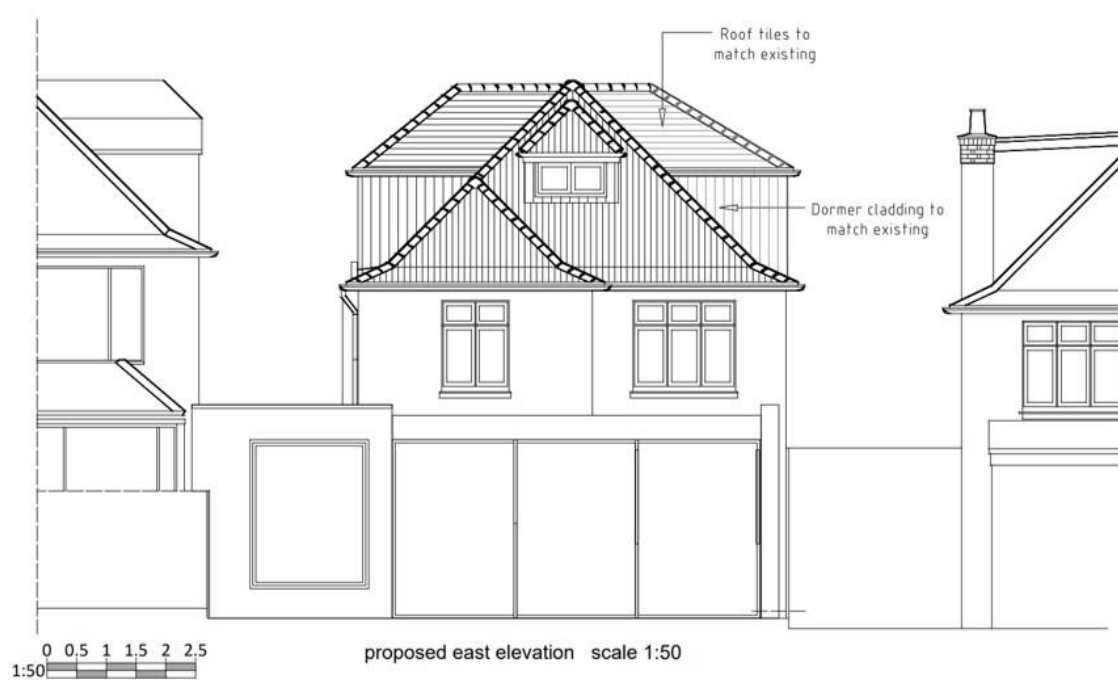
The proposed dormer side extension would mirror an existing extension on the opposite side of the roof and would be clad in matching materials, to remain consistent with existing.
